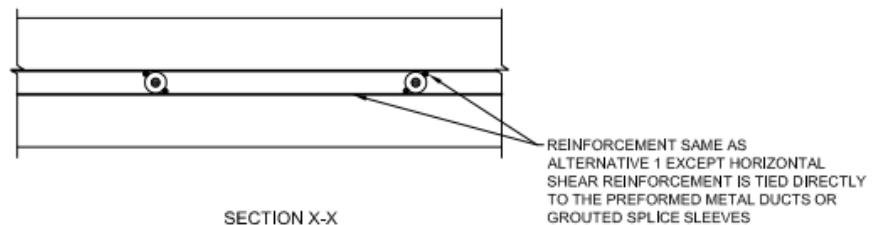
EXTERIOR WALL TO FLOOR SLAB CONNECTION
